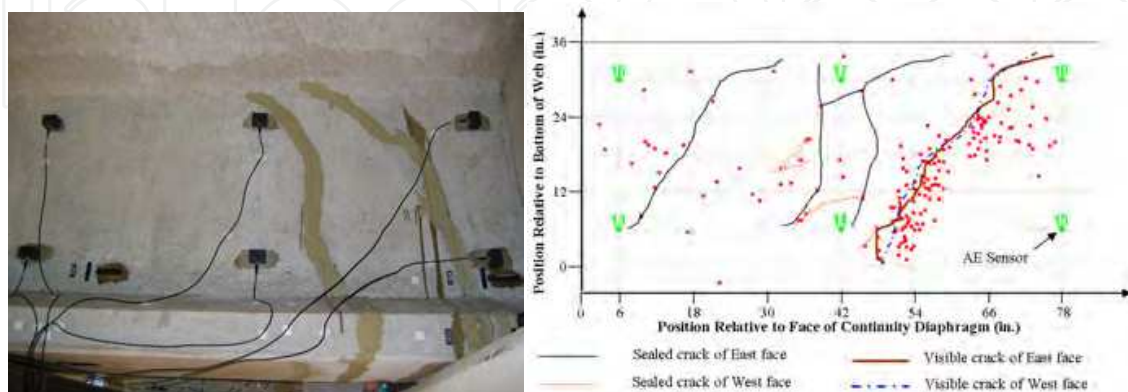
AE for Detection of Active Cracking in Prestressed Girder (after Xu, 2008)
